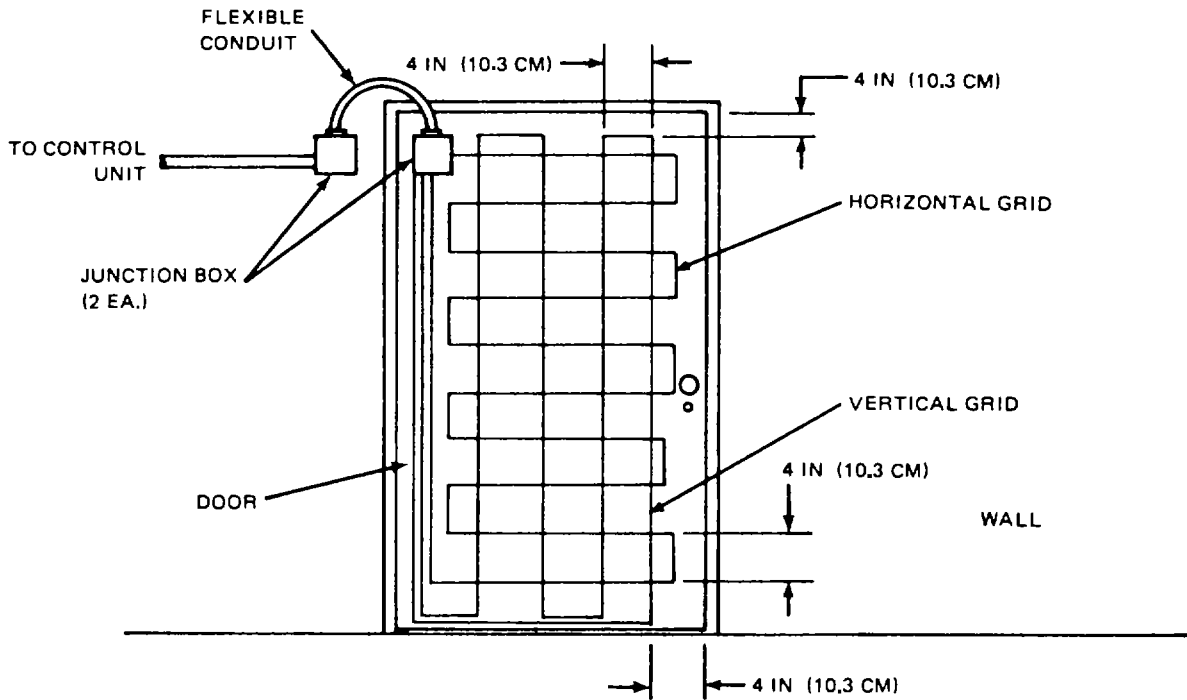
Typical Wire Grid Installation on Wooden Door
